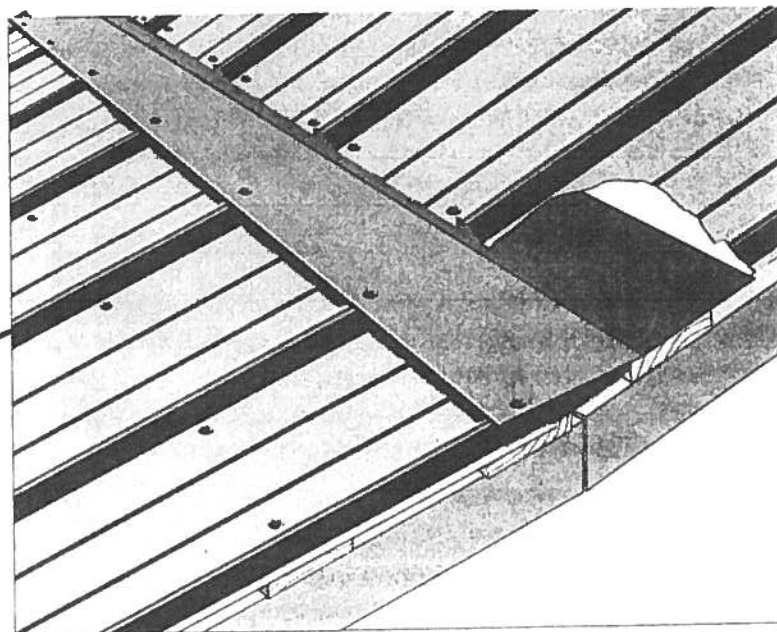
The transition flashing provides a continuous drainage where two slopes meet.
